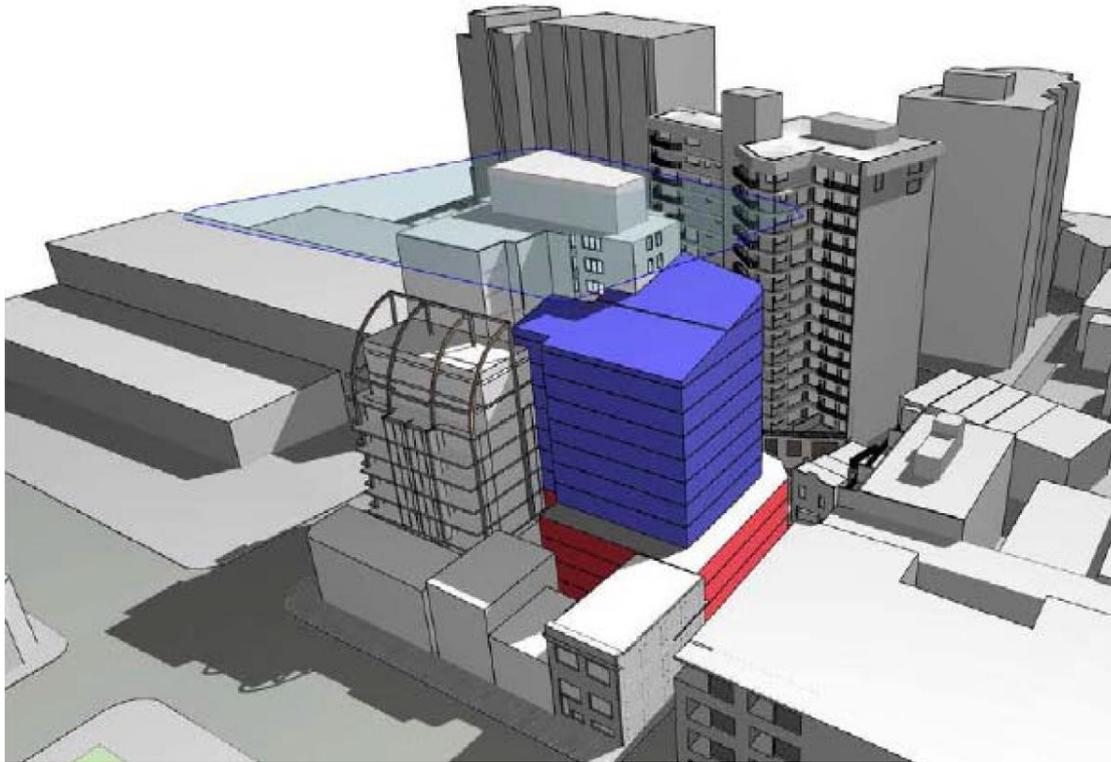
A model of the approved tower and podium envelope (southeast corner on Lower Campbell Street and as viewed from Campbell Street)
